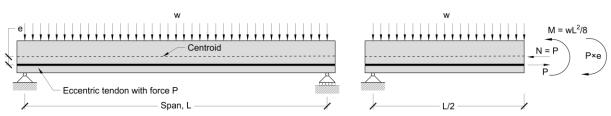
Prestressed concrete member with eccentric tendons. Elevation view (left) and free body diagram at midspan (right).
